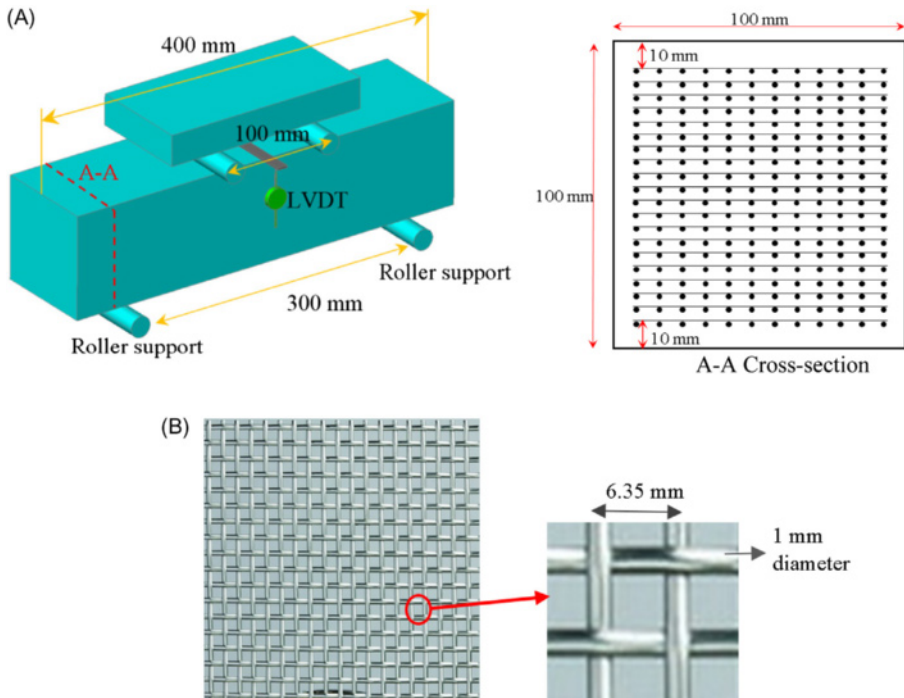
Setup of SWM beam sample tests: (A) beam dimensions and cross-section in bending tests and (B) SWM reinforcement dimension.
